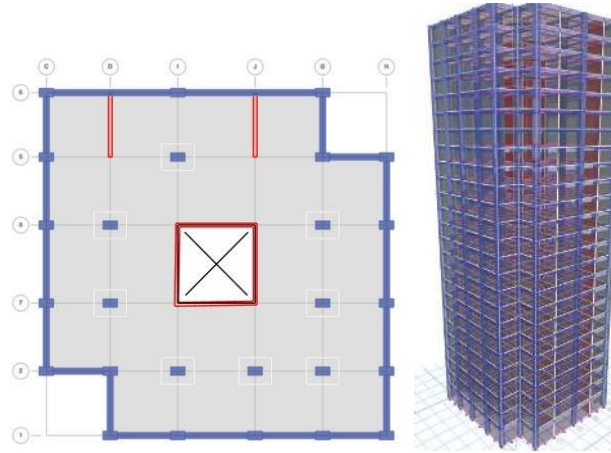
Waffle Floor Model Isometric & Plan View.
